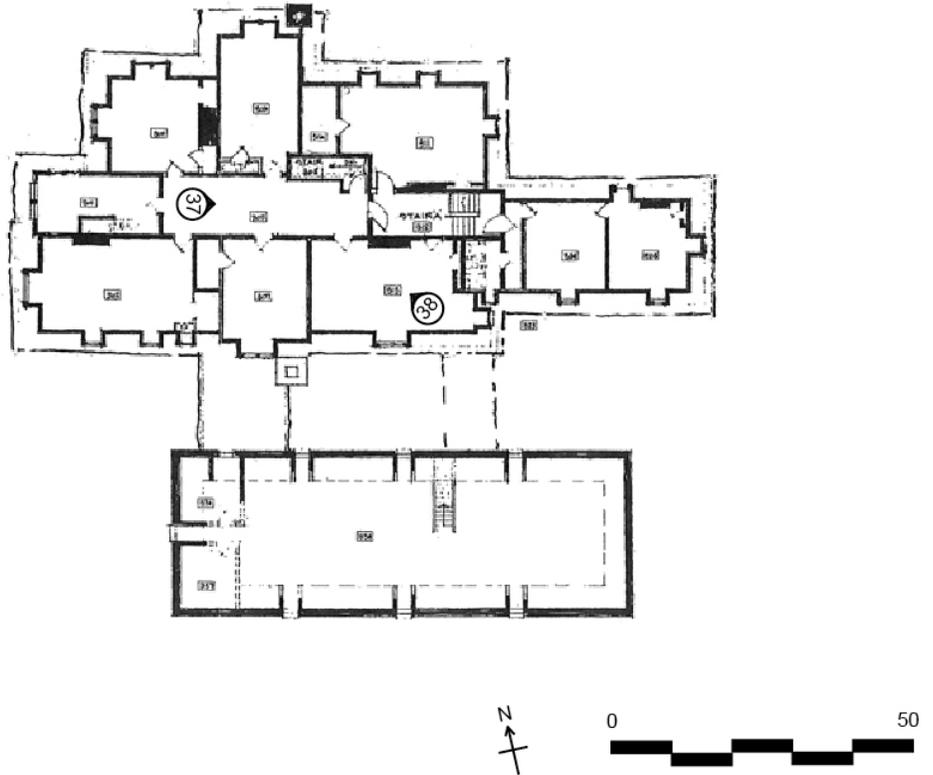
Figure G. Classroom Complex—Existing Conditions—Third Floor Plan—Keyed to Photographs
